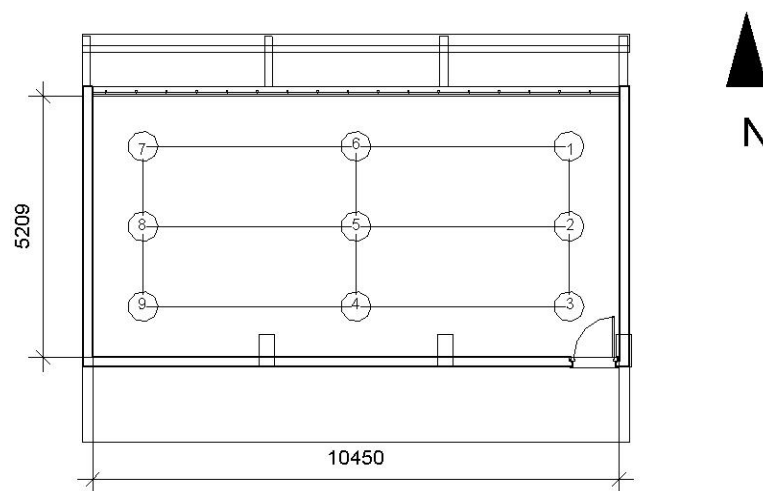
The 300 level lecture room, Department of Building floor plan showing sensor points
